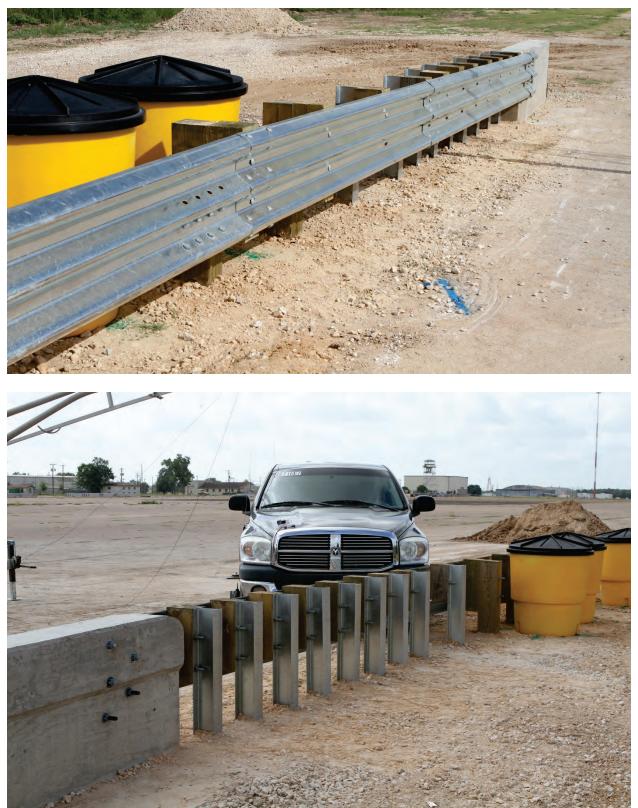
Short Radius Guardrail (Primary Road) before Test No. 467114-7.
